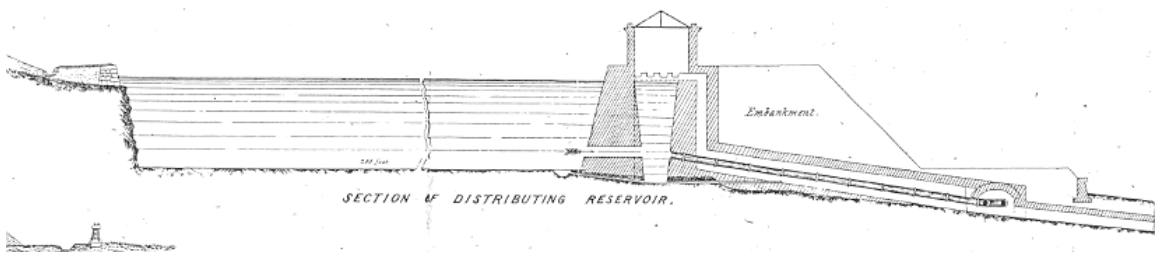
Section of distributing reservoir, detail, 1854 (detail)
